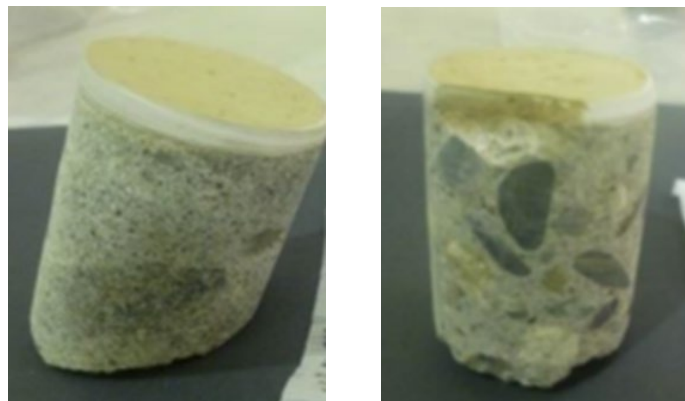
Floor samples collected in the southeast area of the 1st floor [7]
